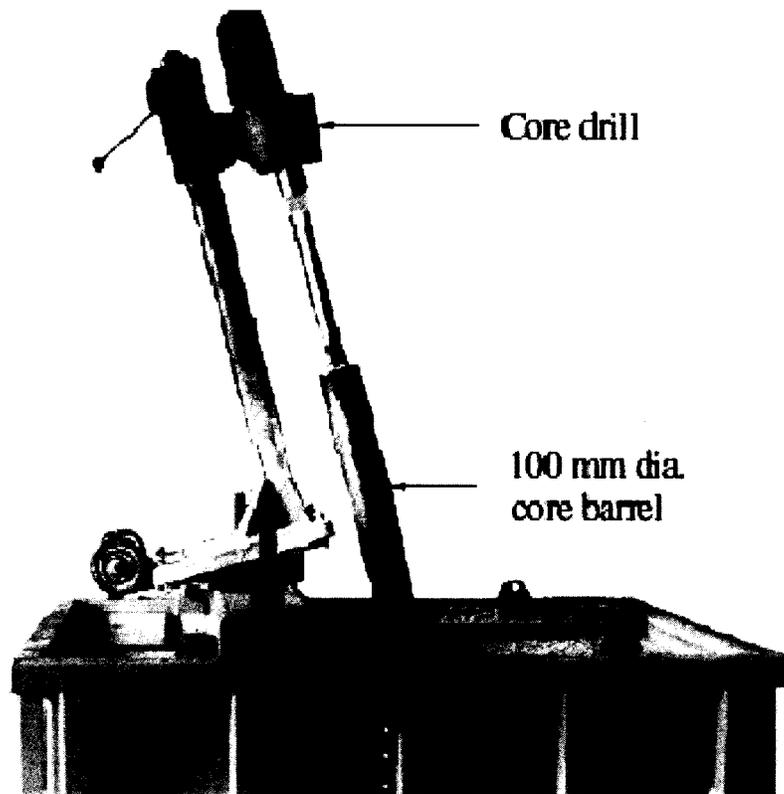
Drilling set-up for soil nails inclined at 15 degrees
